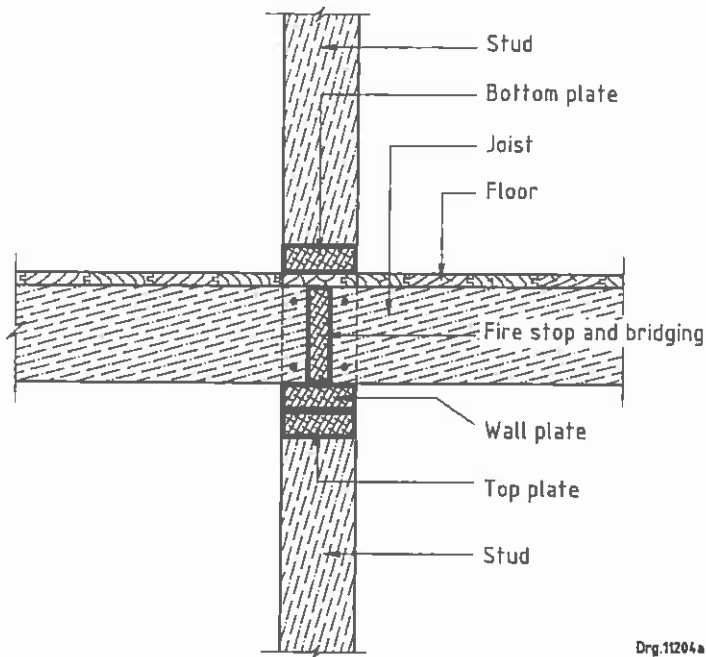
Platform frame construction — First floor framing over load-bearing wall
